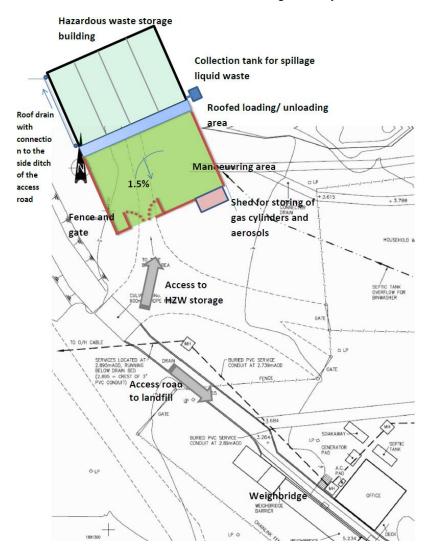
Proposed location of the Hazardous Waste Interim Storage Facility based on a drawing prepared in the context of the landfill construction
